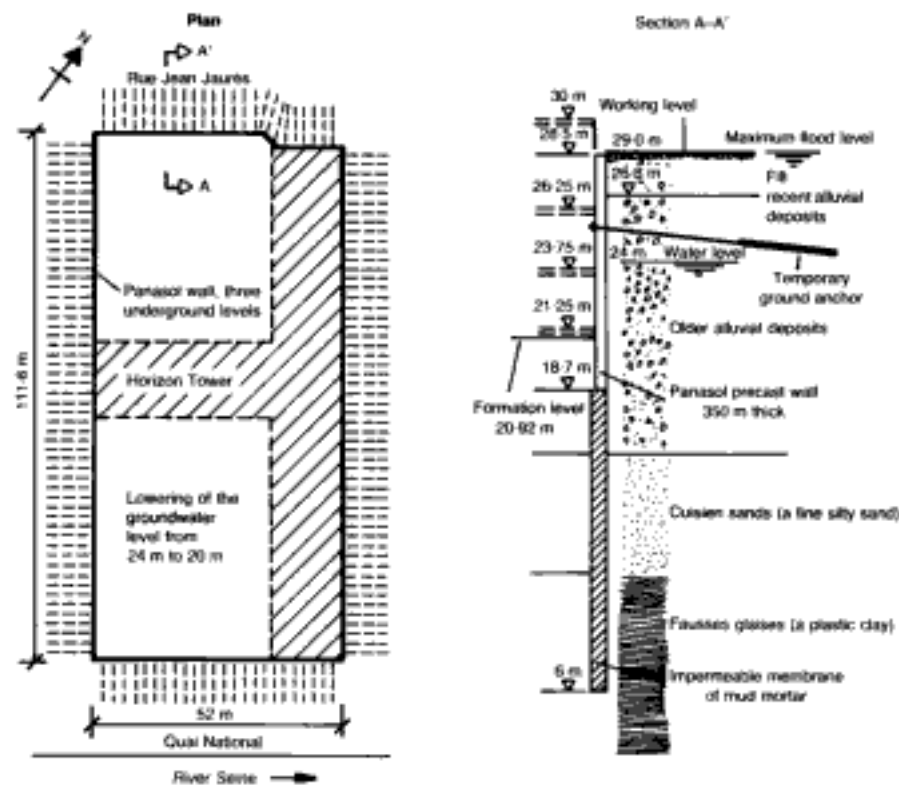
Composite wall construction using precast wall and slurry cut-off, Horizon Tower at Puteaux, Paris (courtesy of Soletanche)
